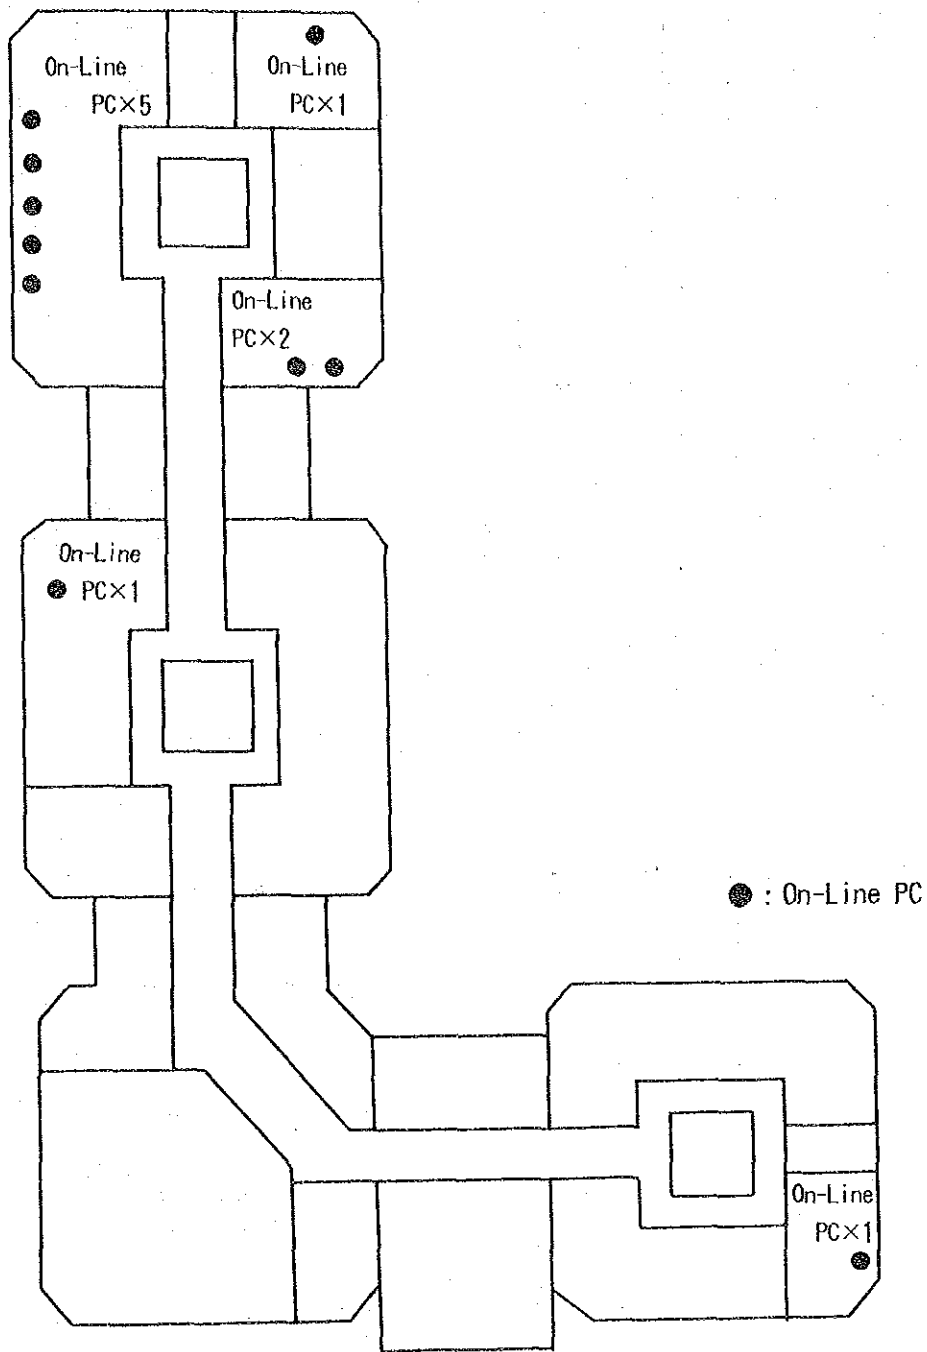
Floor Layout Plan of On-line Personal Computers (1/3)
